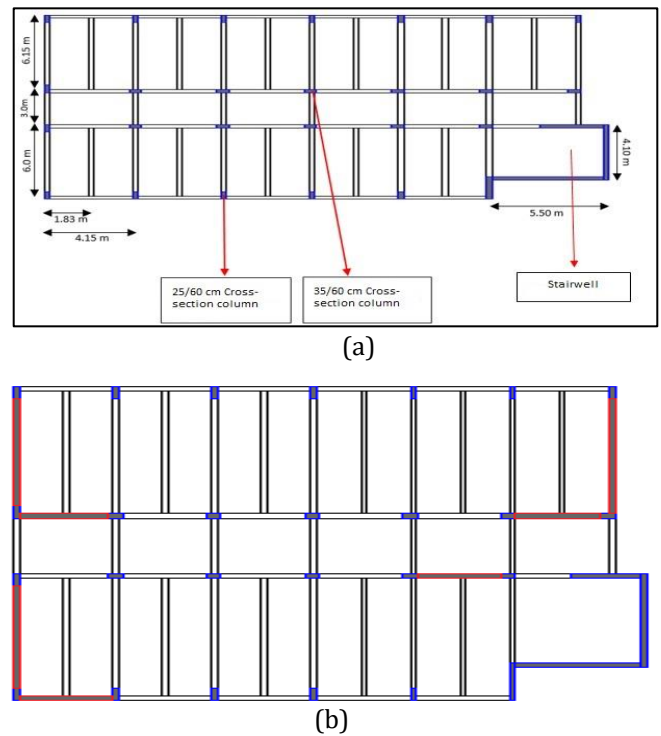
View of the school building B block plan; (a) before retrofitting (b) after retrofitting
